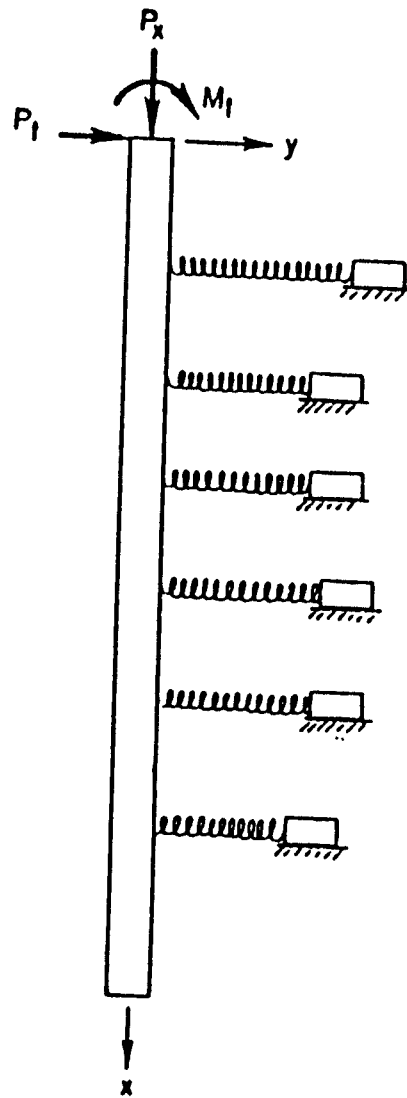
MODEL OF Laterally LOADED PILE USING DISCRETE WINKLER SPRINGS
